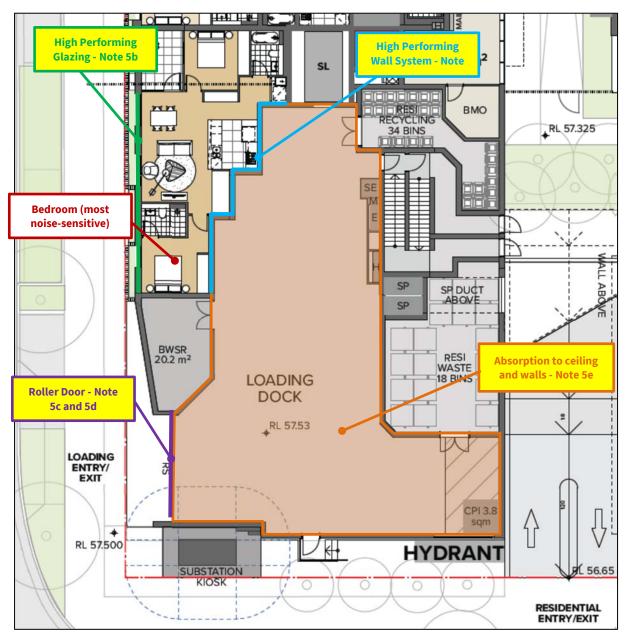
Loading dock was on Level 1 of Building 2A (image source – architectural drawings)
